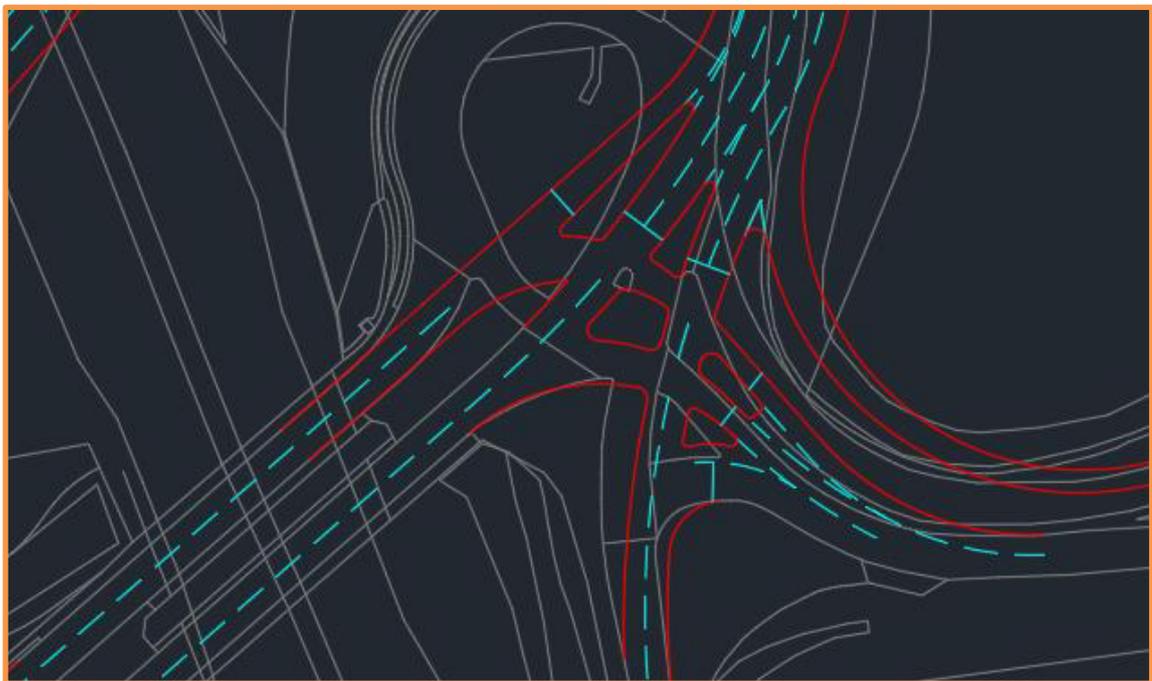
sketch layout utilising both existing bridge decks for southbound circulatory carriageway
